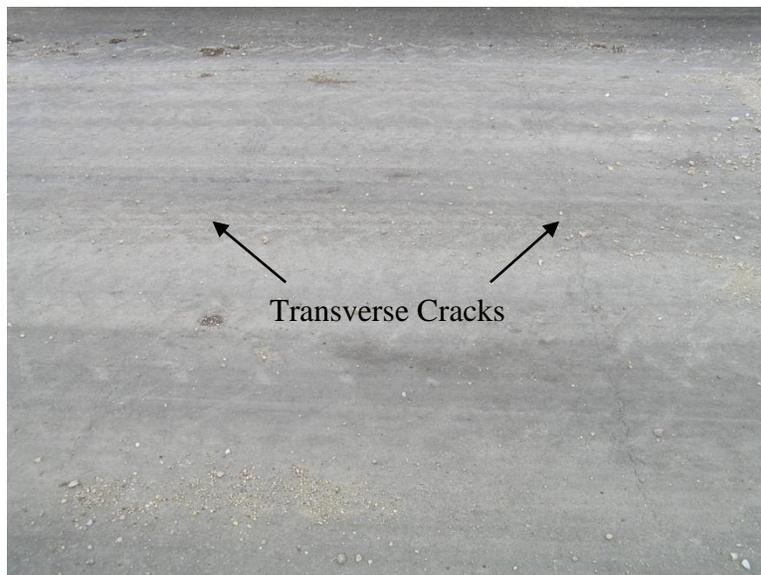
Transverse cracking evident one month post construction on Span 2
